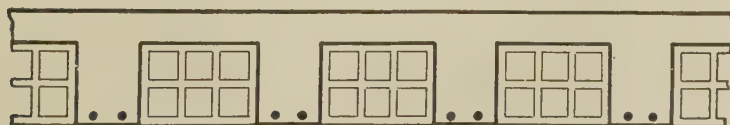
Typical Reinforced Concrete Beam-and-Tile Construction.
